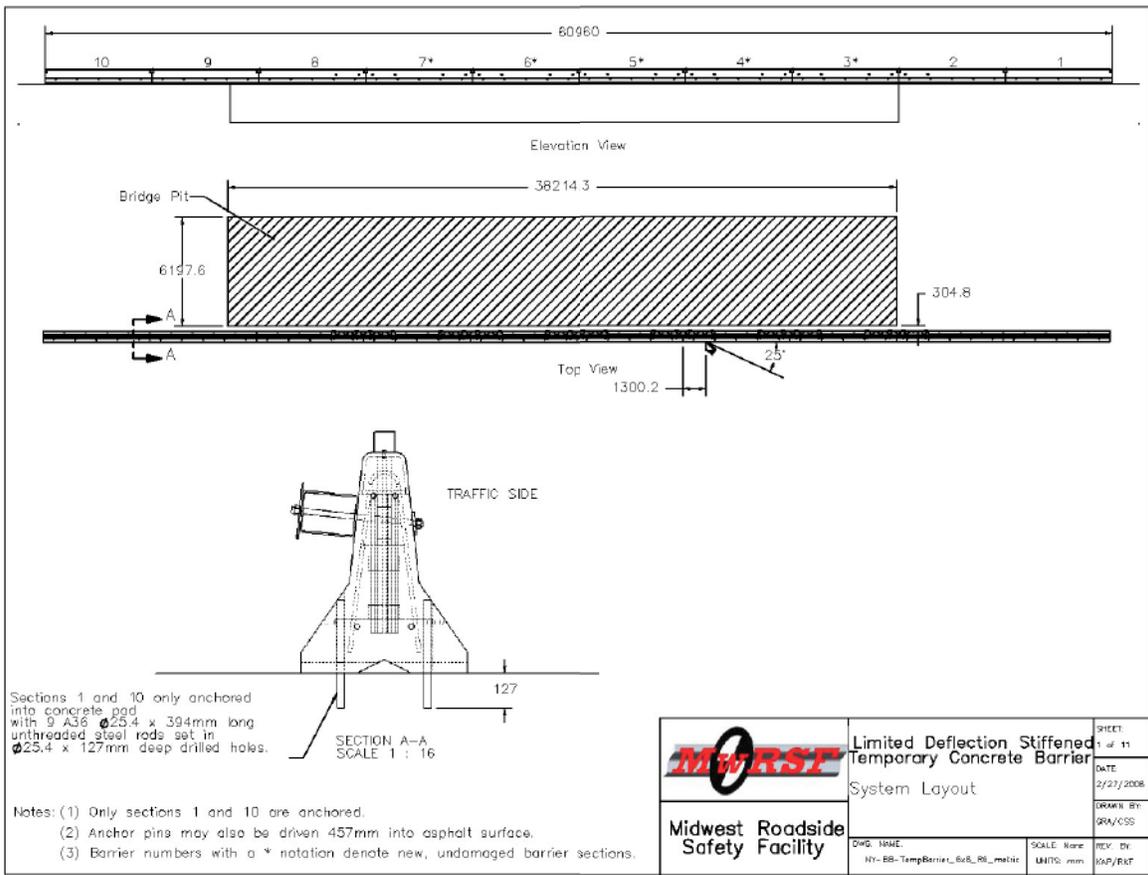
Stiffened Temporary Concrete Barrier System Layout, Test NYTCB-3
